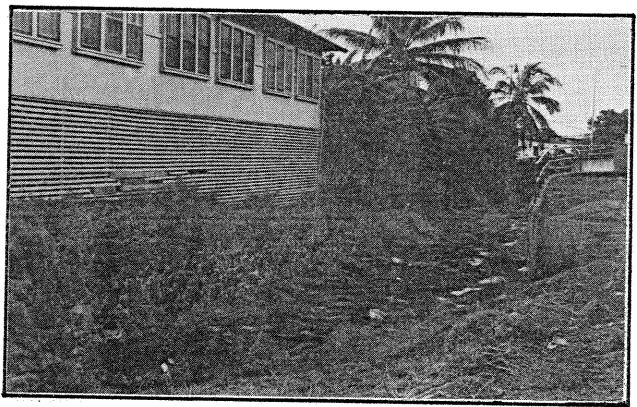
Typical unimproved stream channel adjacent to the private school near the Aiea Shopping Center. Note the low wall that forms the southerly bank. View downstream.
